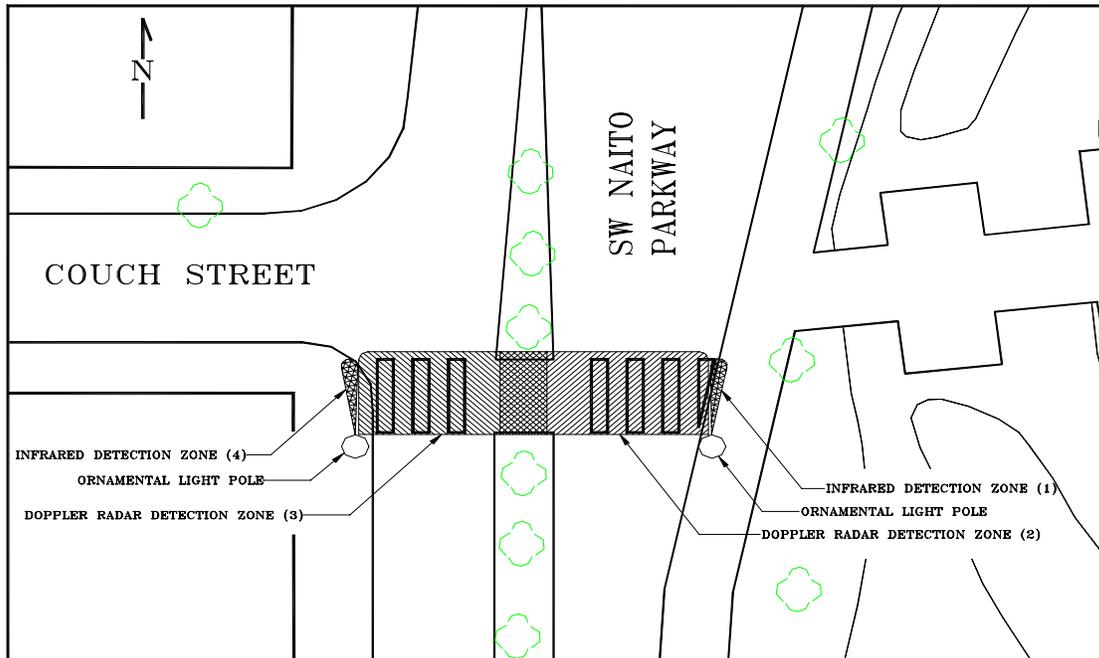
Plan View of Pedestrian Crossing at SW Naito Parkway and Couch Street.
